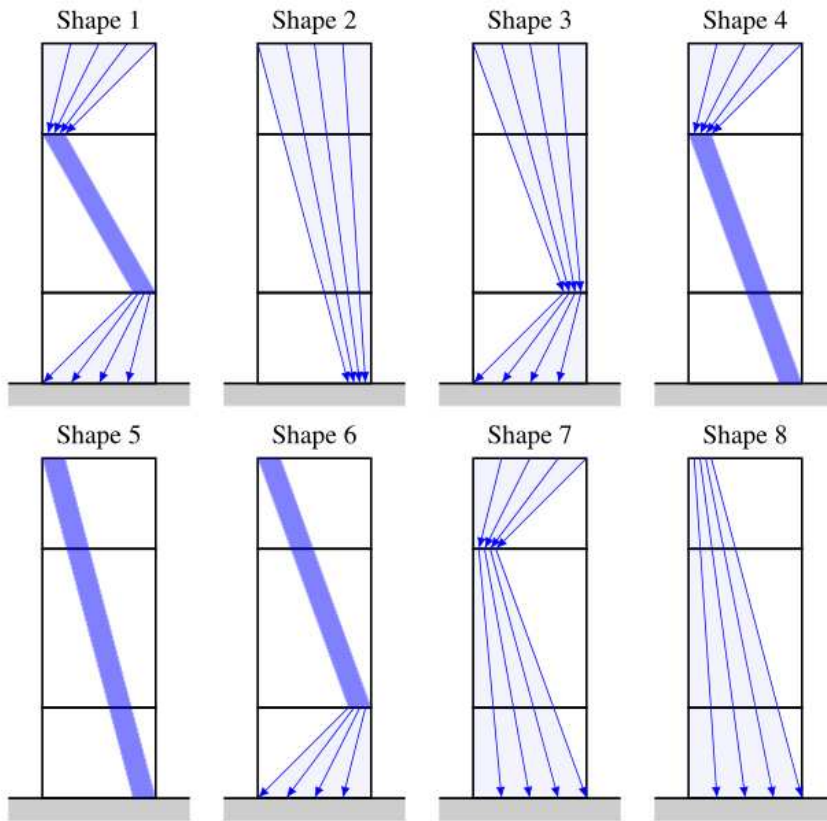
Potential failure shapes for base-pier-spandrel sub-system. Disposition of stress fans and compressive struts.
